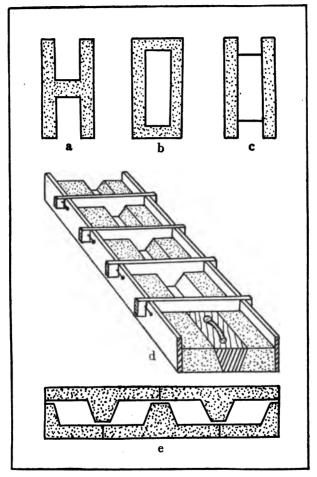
Four Styles of "Cast Stone" Rlocks Easily Molded with Sand Molds.
